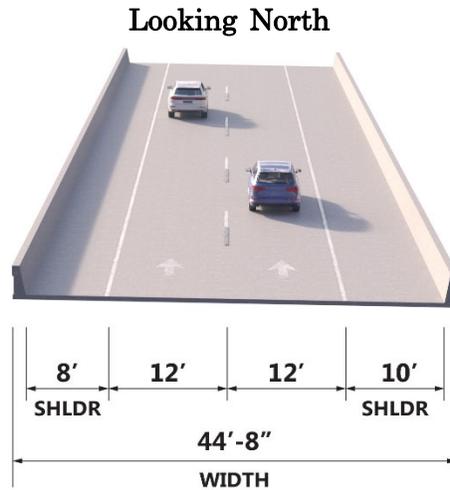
Proposed Northbound US 41 Bridge over SR 597 (N. Dale Mabry Highway) Typical Section
